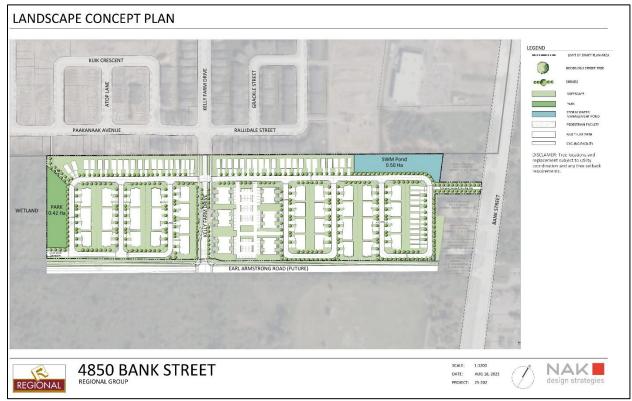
Landscape Concept Plan prepared by NAK dated August 18, 2025.
